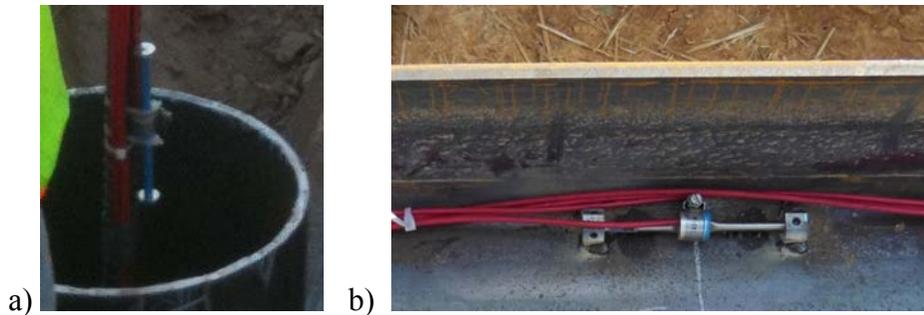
The VWSGs Used to Measure Load Transfer Distribution. a) Concrete Embeddable (Geokon Model 4200) VWSG Installed in CIP Test Piles. b) Weldable (Geokon Model 4000) VWSG Installed on H-Section Test Pile.
